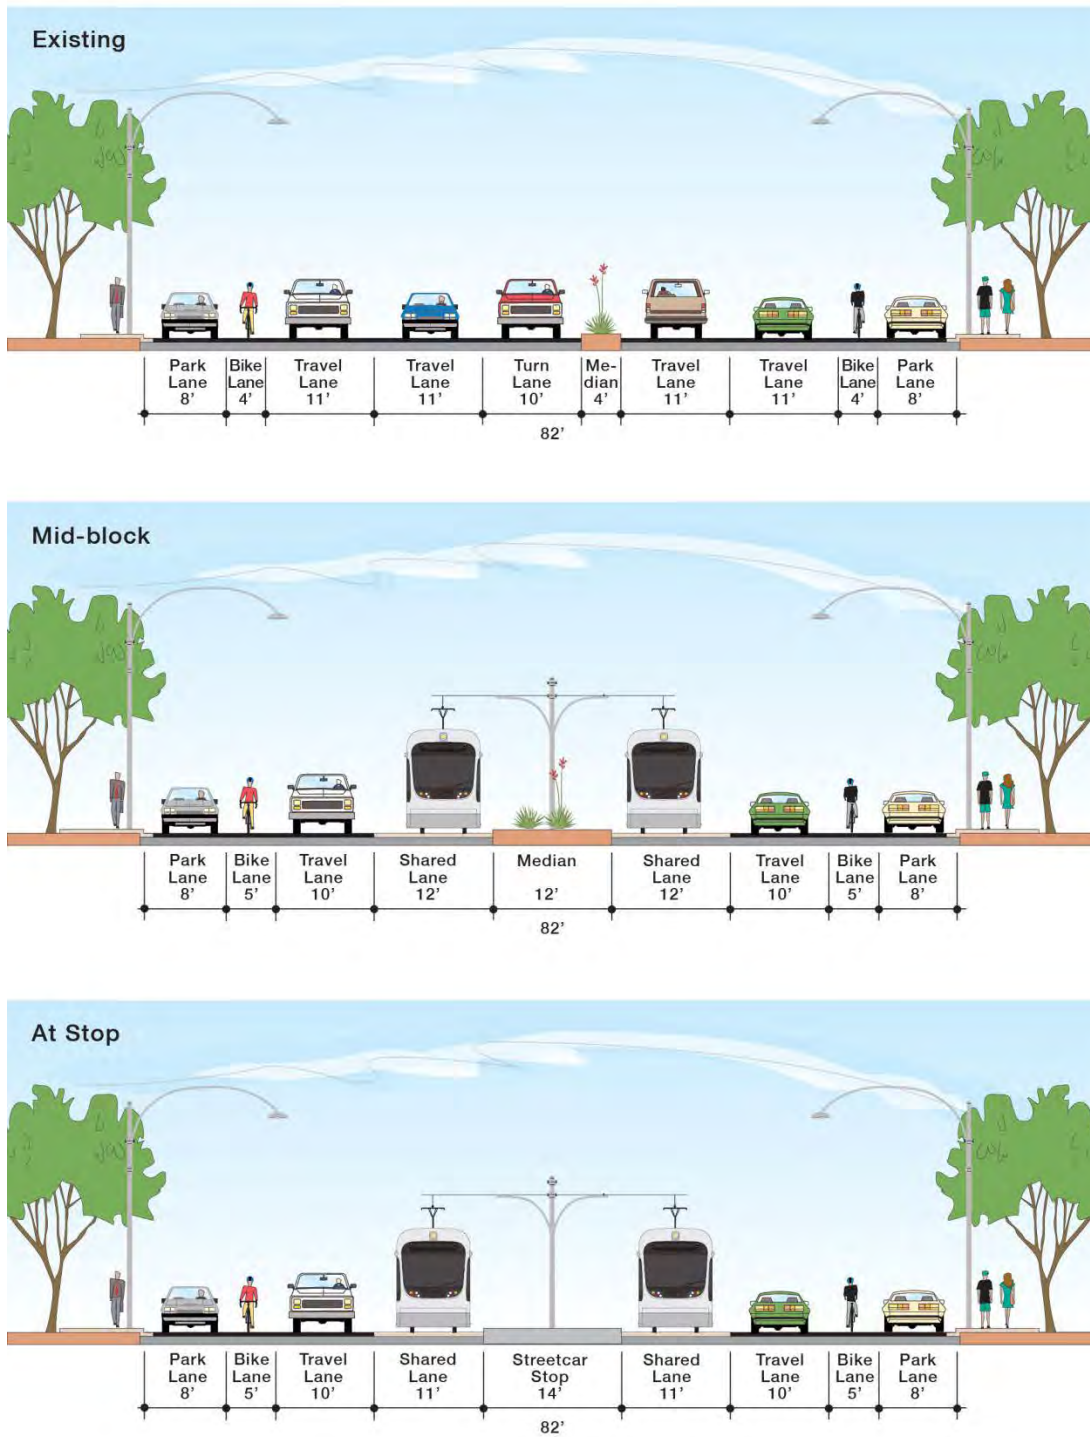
BUILD ALTERNATIVE, APACHE BOULEVARD LOOKING EAST
